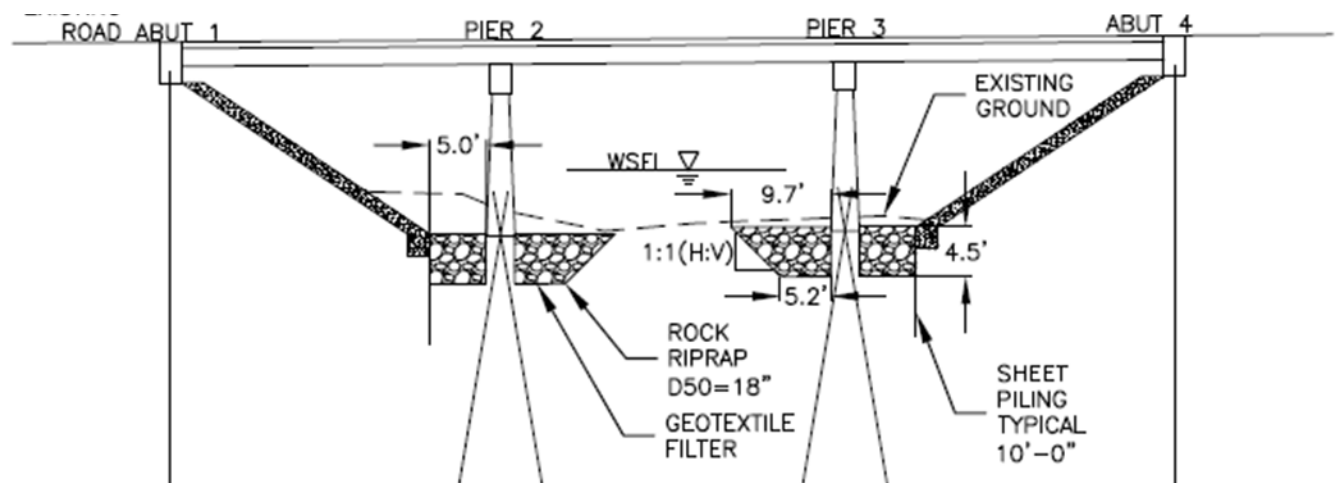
Cross-sectional view of Bridge G-19-A with recommended hydraulic scour countermeasures
